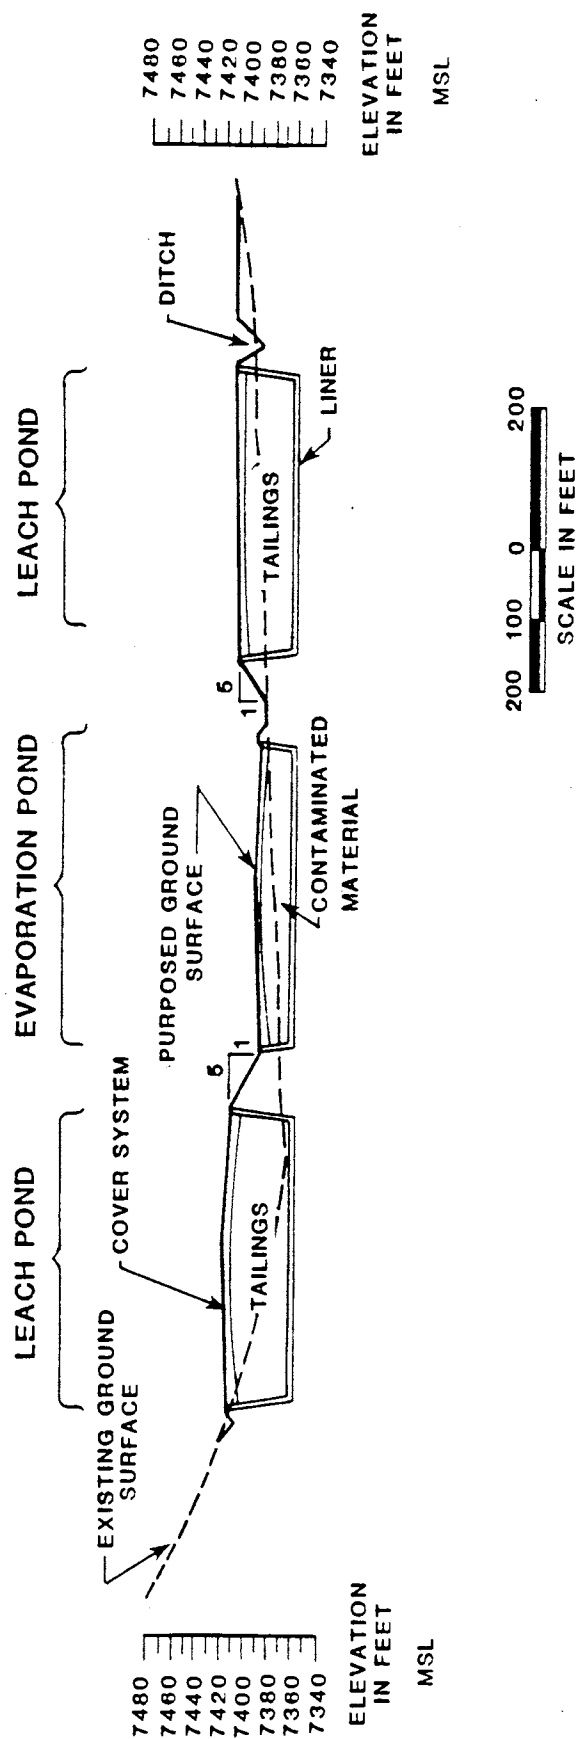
CROSS SECTION OF LONG HOLLOW REPROCESSING ALTERNATIVE
